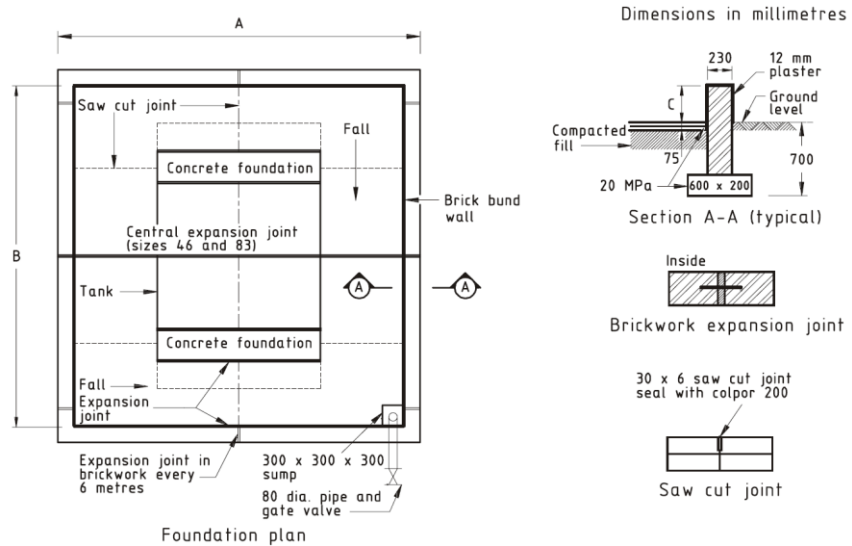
Typical horizontal cylindrical storage tank with bund wall for above-ground storage
